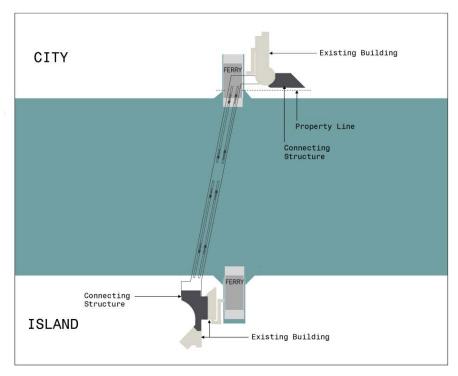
Proposed site plan by TPA (Source: Toronto Post Authority's Website)
